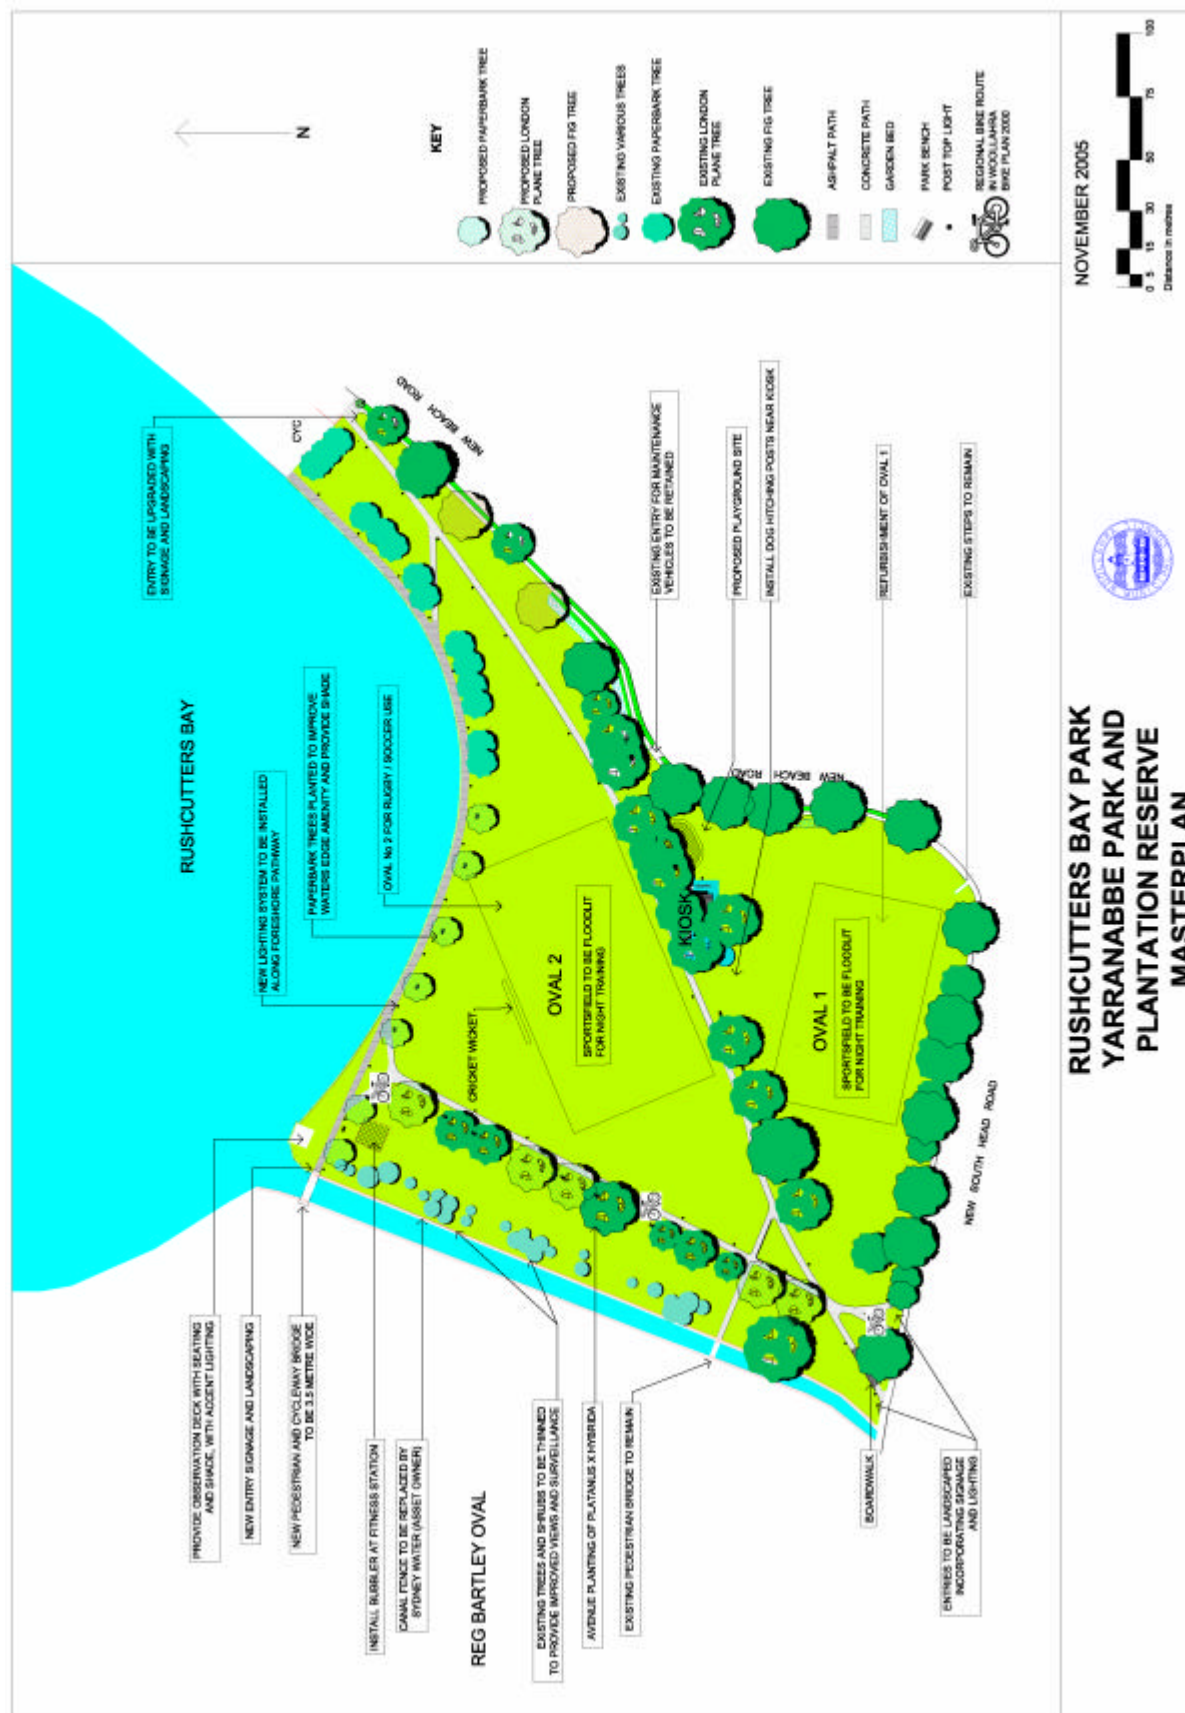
Landscape Master Plan for Yarranabbe Park
